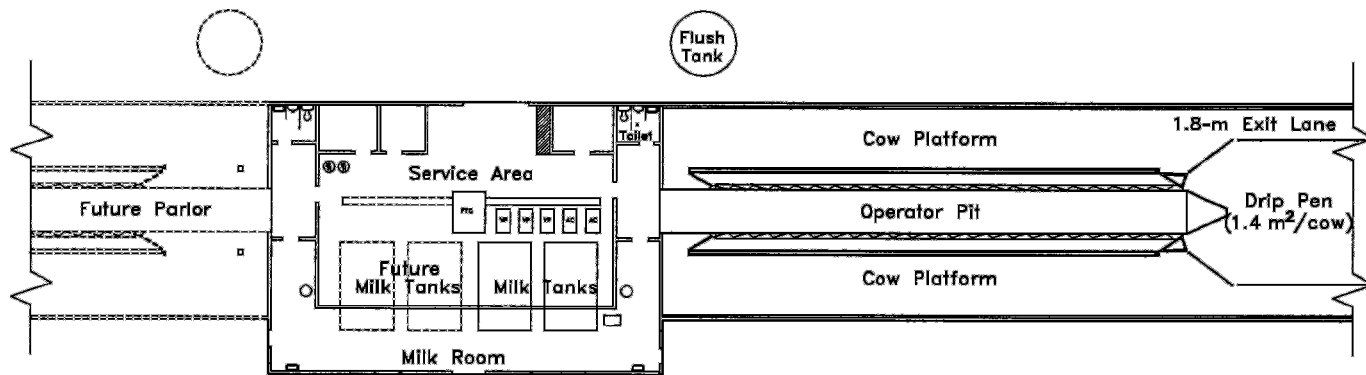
A double-24 parlor with room to construct a second parlor end to end.
